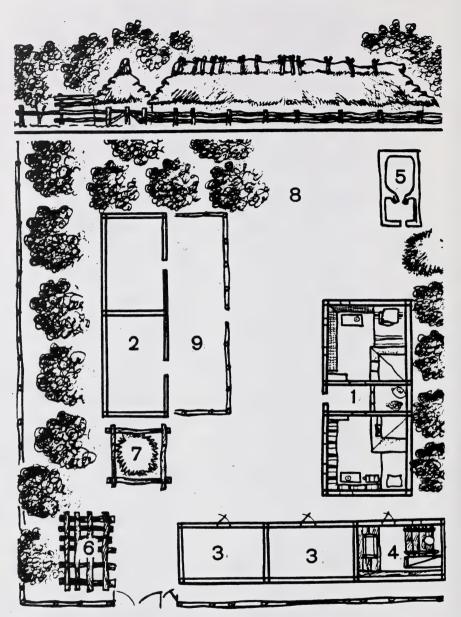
Potter's yard plan with free arrangement buildings in southwest Ukraine, circa 1900. 1-house; 2-machine and implement shed; 3-storage area; 4-forge; 5-oven; 6-firewood storage; 7-clay storage; 8-garden; 9-corral. (In T.V. Kosmina, Silske zhytlo Pod: Kiev: Naukova Dumka, 1980), p. 85.
